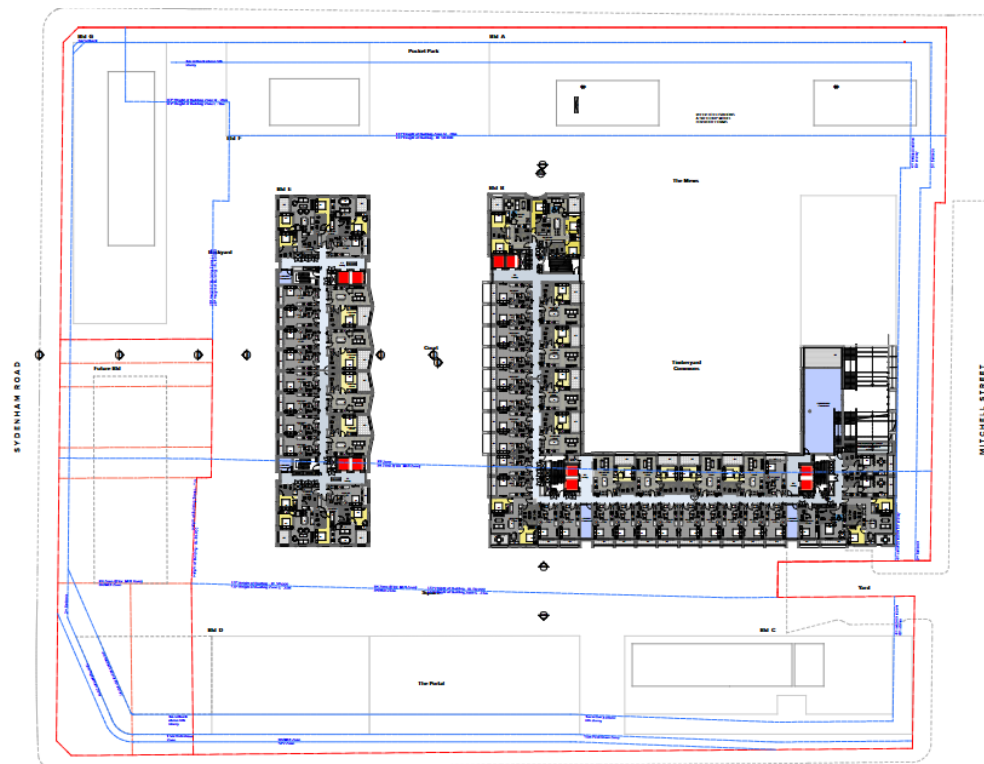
Extract of proposed plans showing concept plan of typical upper level 8 to 11.
